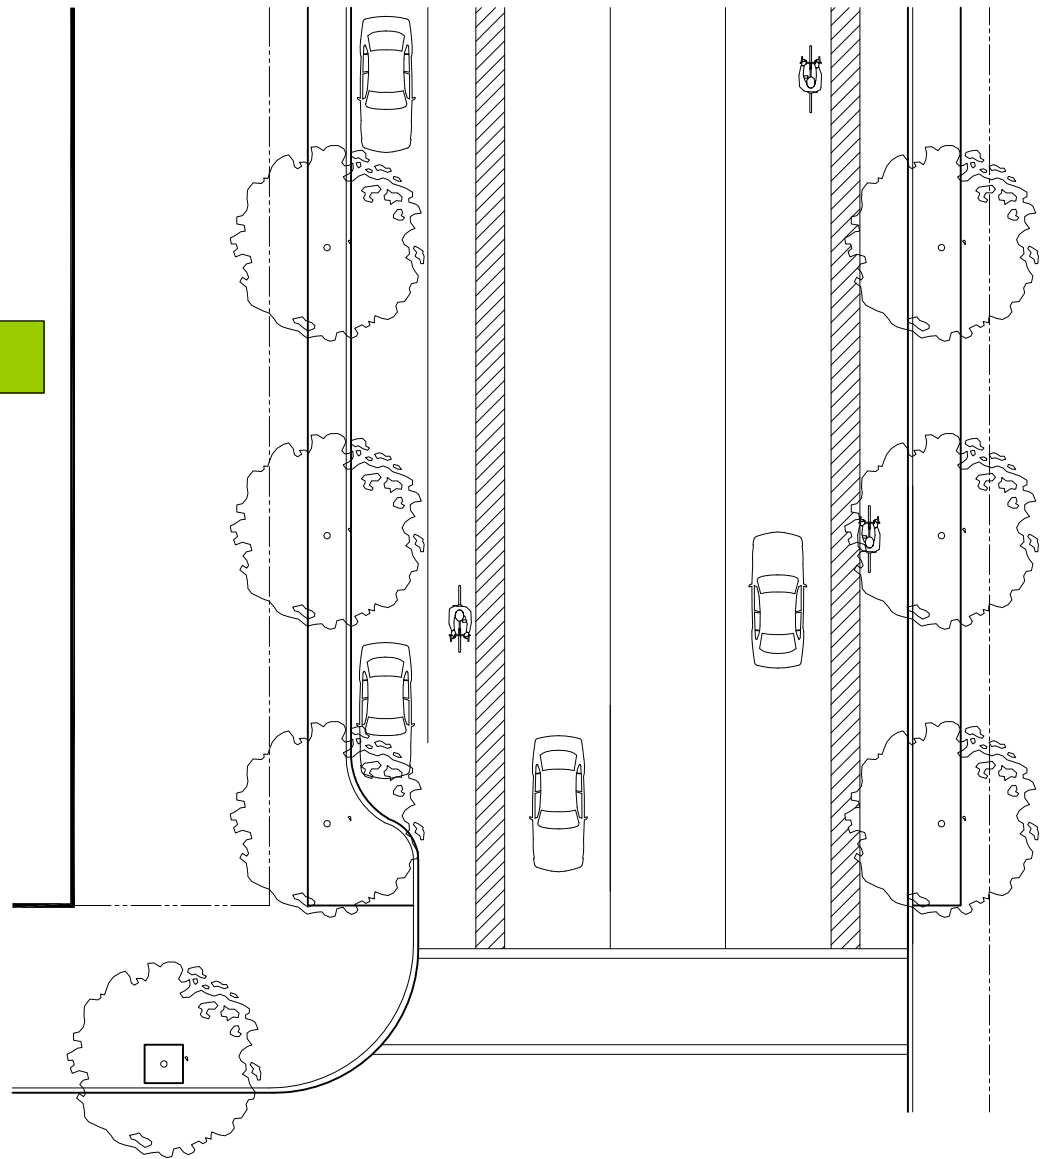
Street Type 4.1: Typical Intersection (Plan View)
